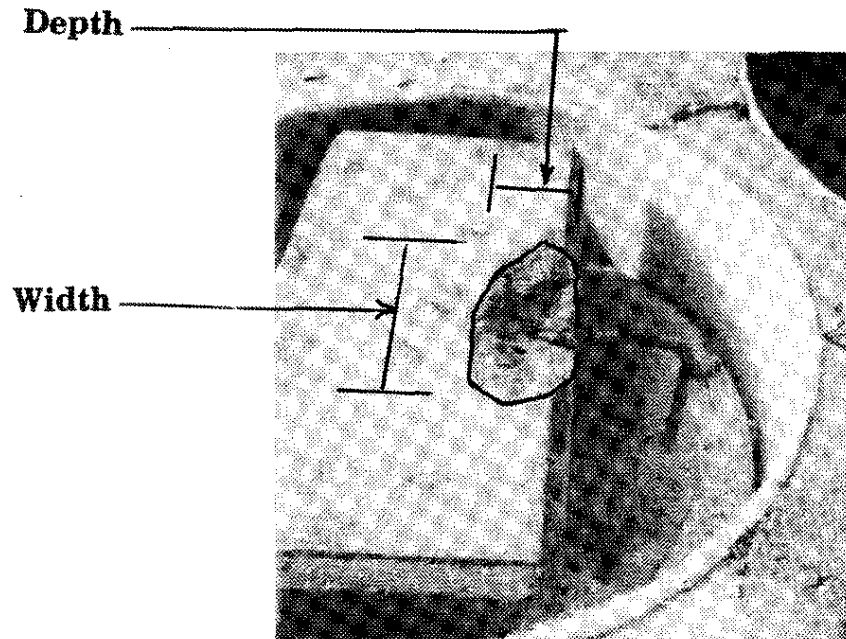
Spalled Concrete on Silo Plug #81
